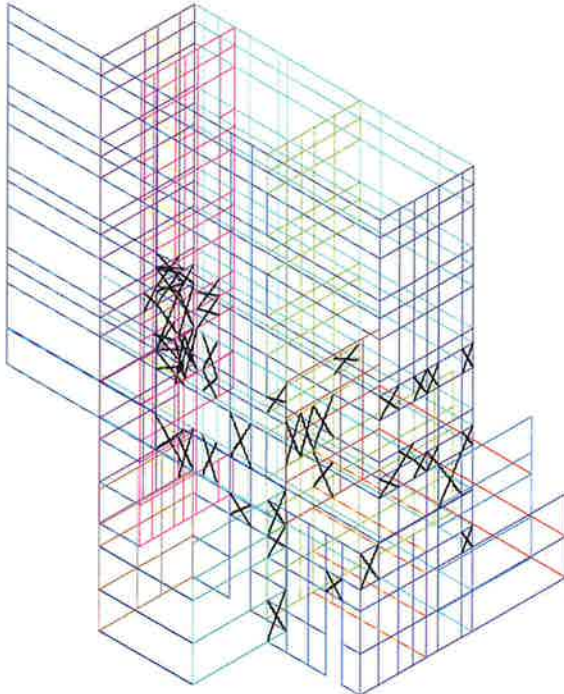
STRENGTHENED X LOADING FULL NZS4203
